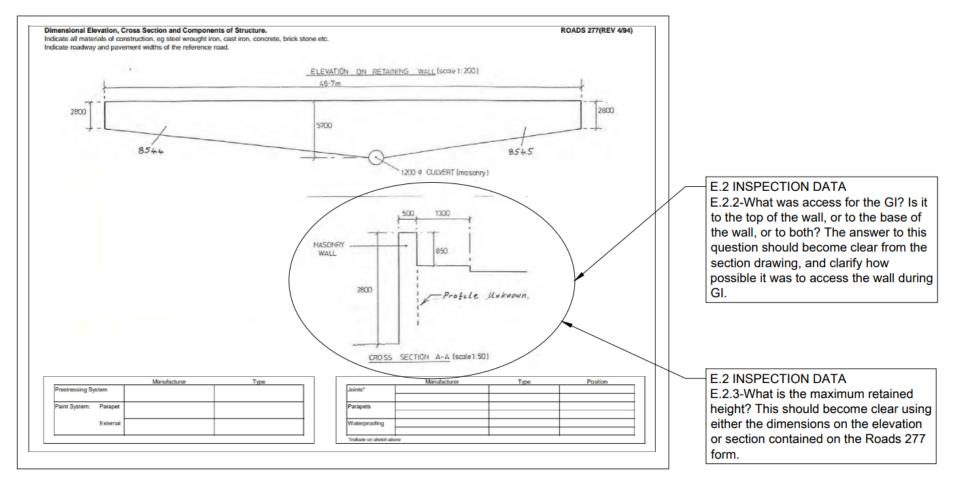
Using the Form Roads 277 to risk assess retaining walls (2 of 2)
